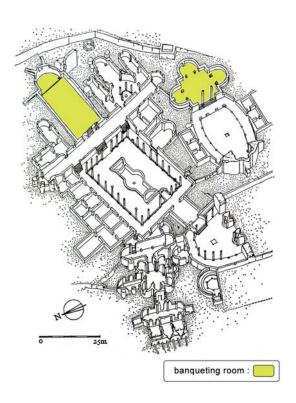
Plans of Some Apsidal Banqueting Rooms (adopted from Ellis, 2000, 173)
